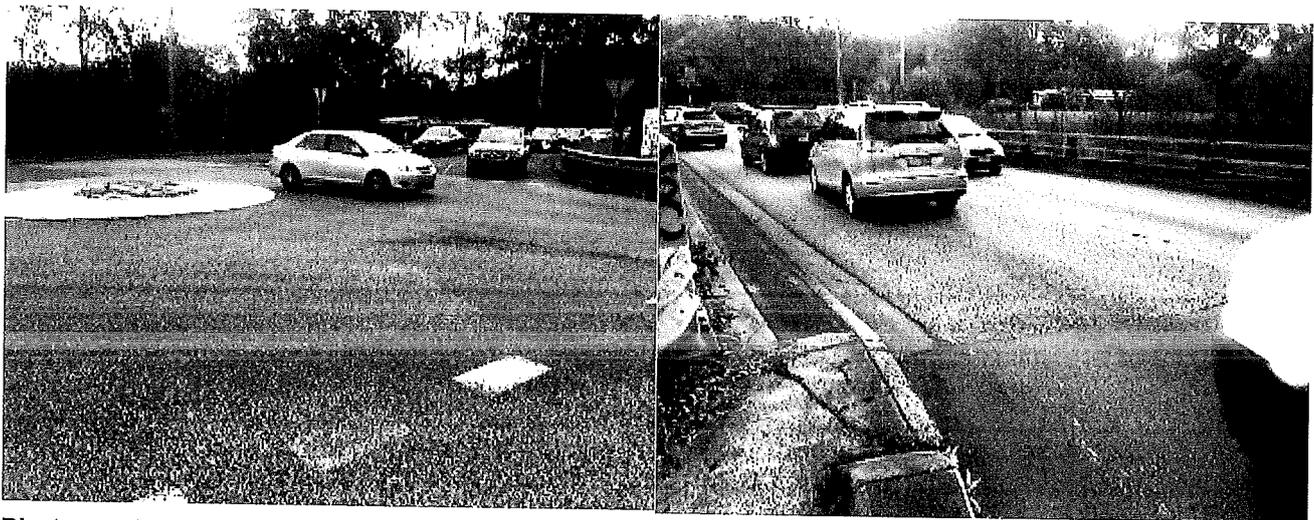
Rhyolite roundabout at Warners Bay 11-6-2021 in poor condition.
